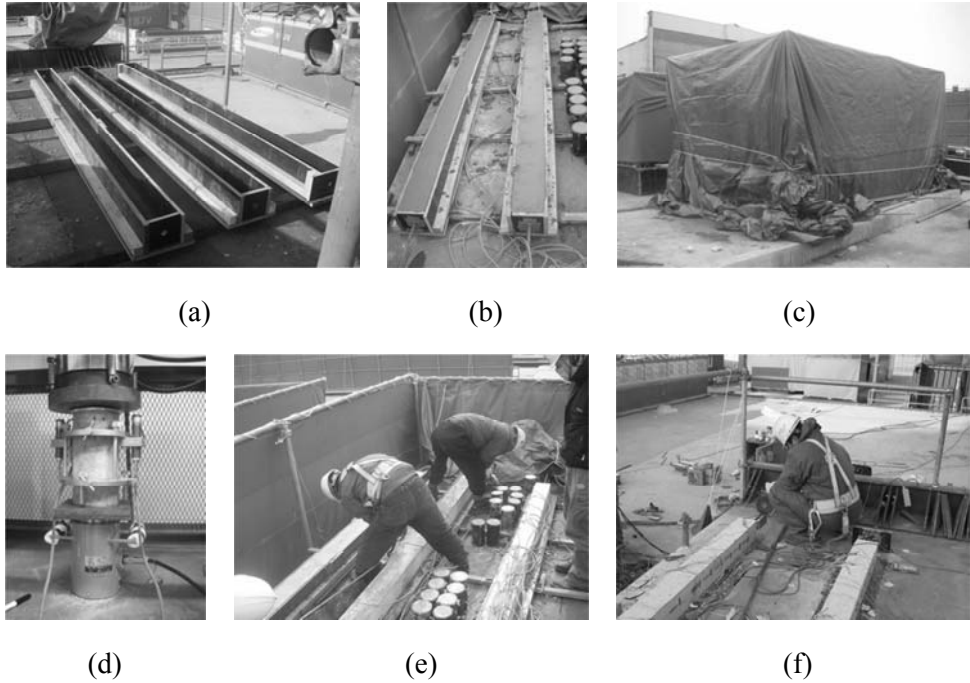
Procedure of specimen fabrication: (a) formwork; (b) concrete placement; (c) steam curing; (d) compressive strength test; (e) form removal; and (f) prestress release by disk cutting
